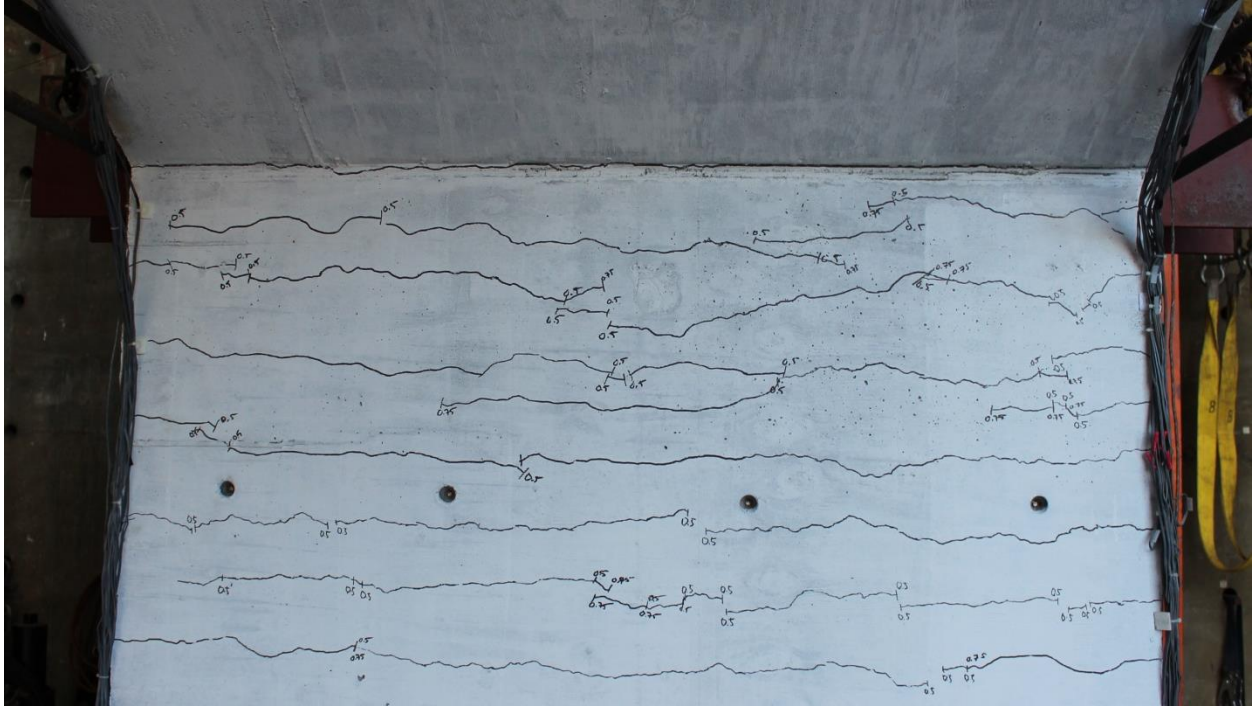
First yield at 0.75% drift ratio (Cycle 5-6). Picture of inside South wall at roof looking South
